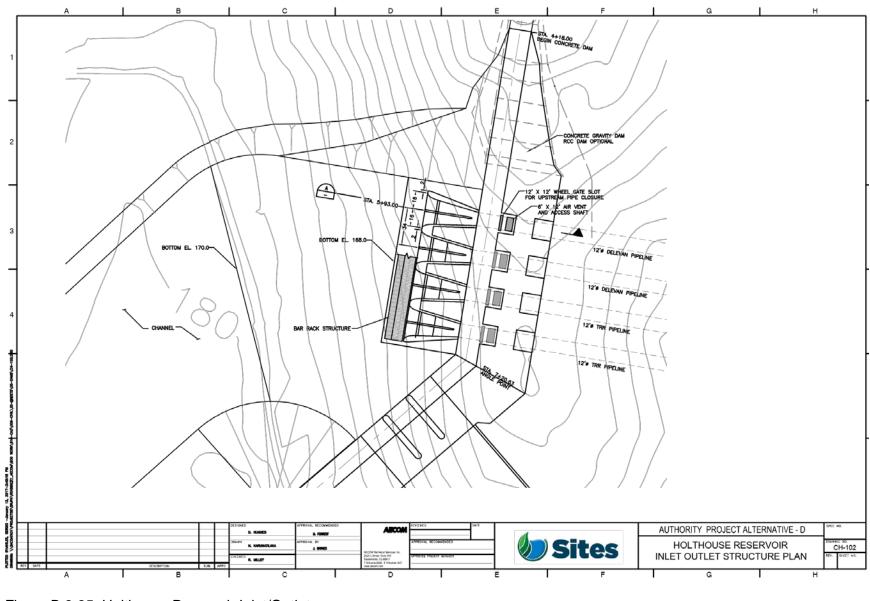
Holthouse Reservoir Inlet/Outlet
